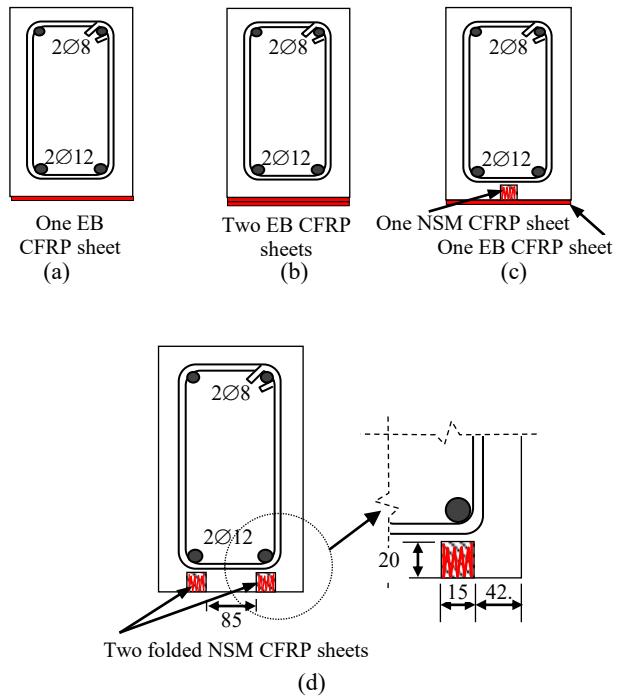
Cross sections of strengthened beams: (a) EB1; (b) EB2; (c) HYB; (d) NSM (All dimensions are in mm).
